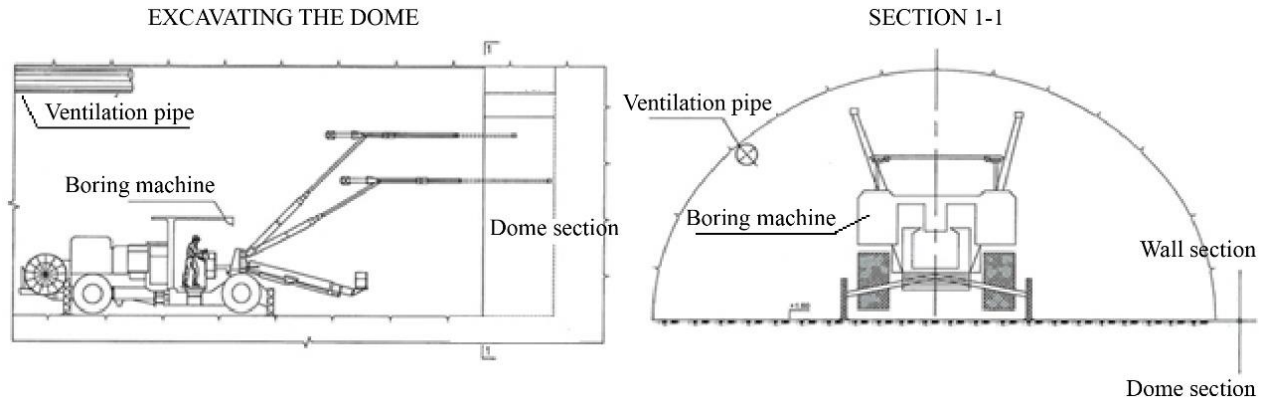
Excavating the entire cross-section of the Son Trieu tunnel dome
